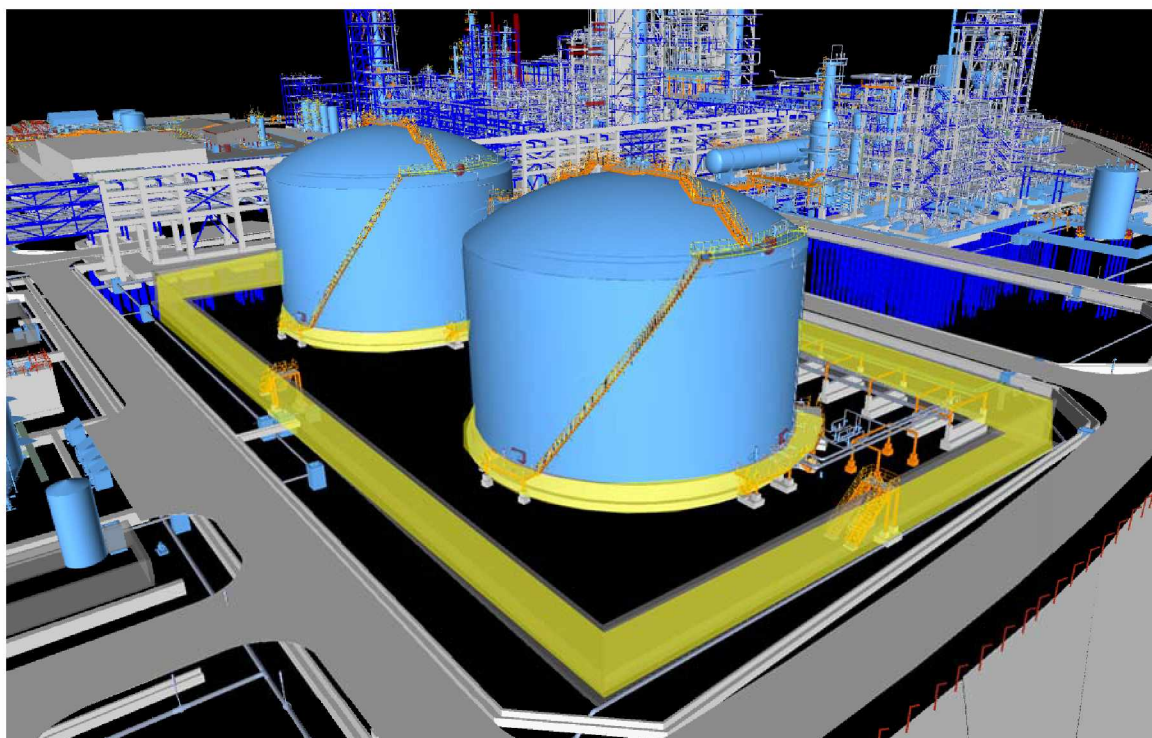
Concrete Dike and Ring foundation for 42FB-01/02
